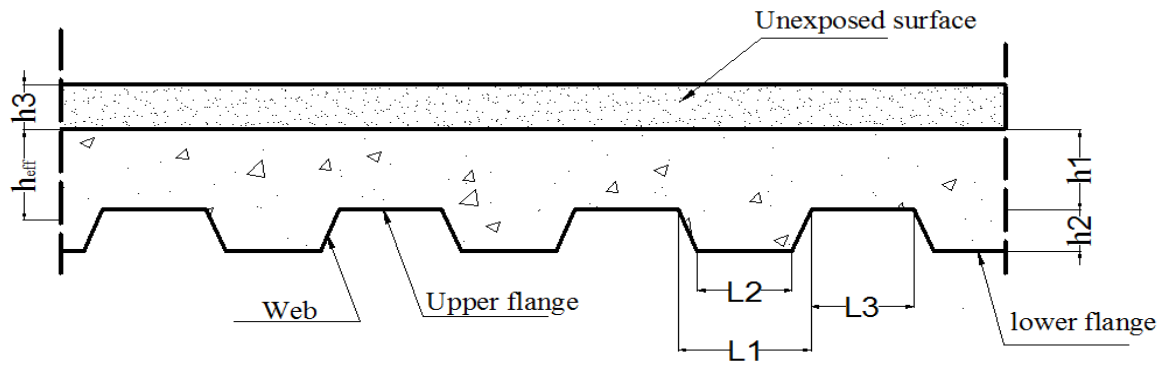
Schematization of the profile of composite slabs with trapezoidal steel deck
